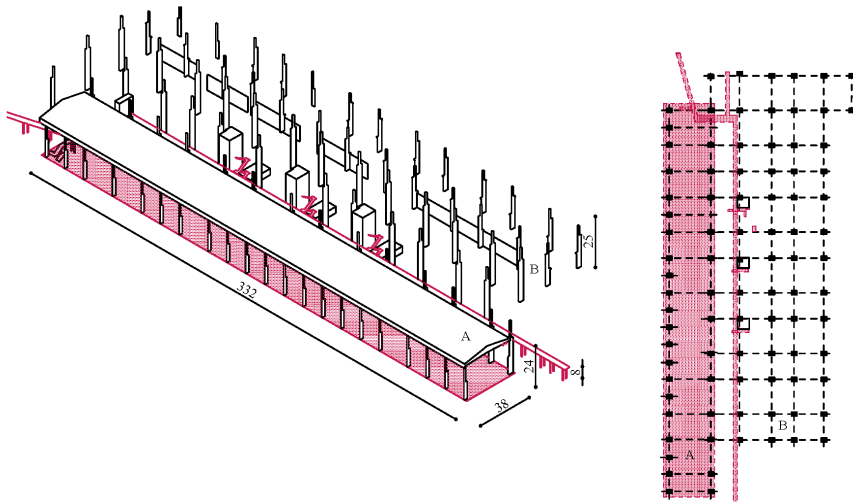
Vitali's sheds, Dora Park, critical redrawing, axonometric view and plan. In red the addition, in black the existing.
